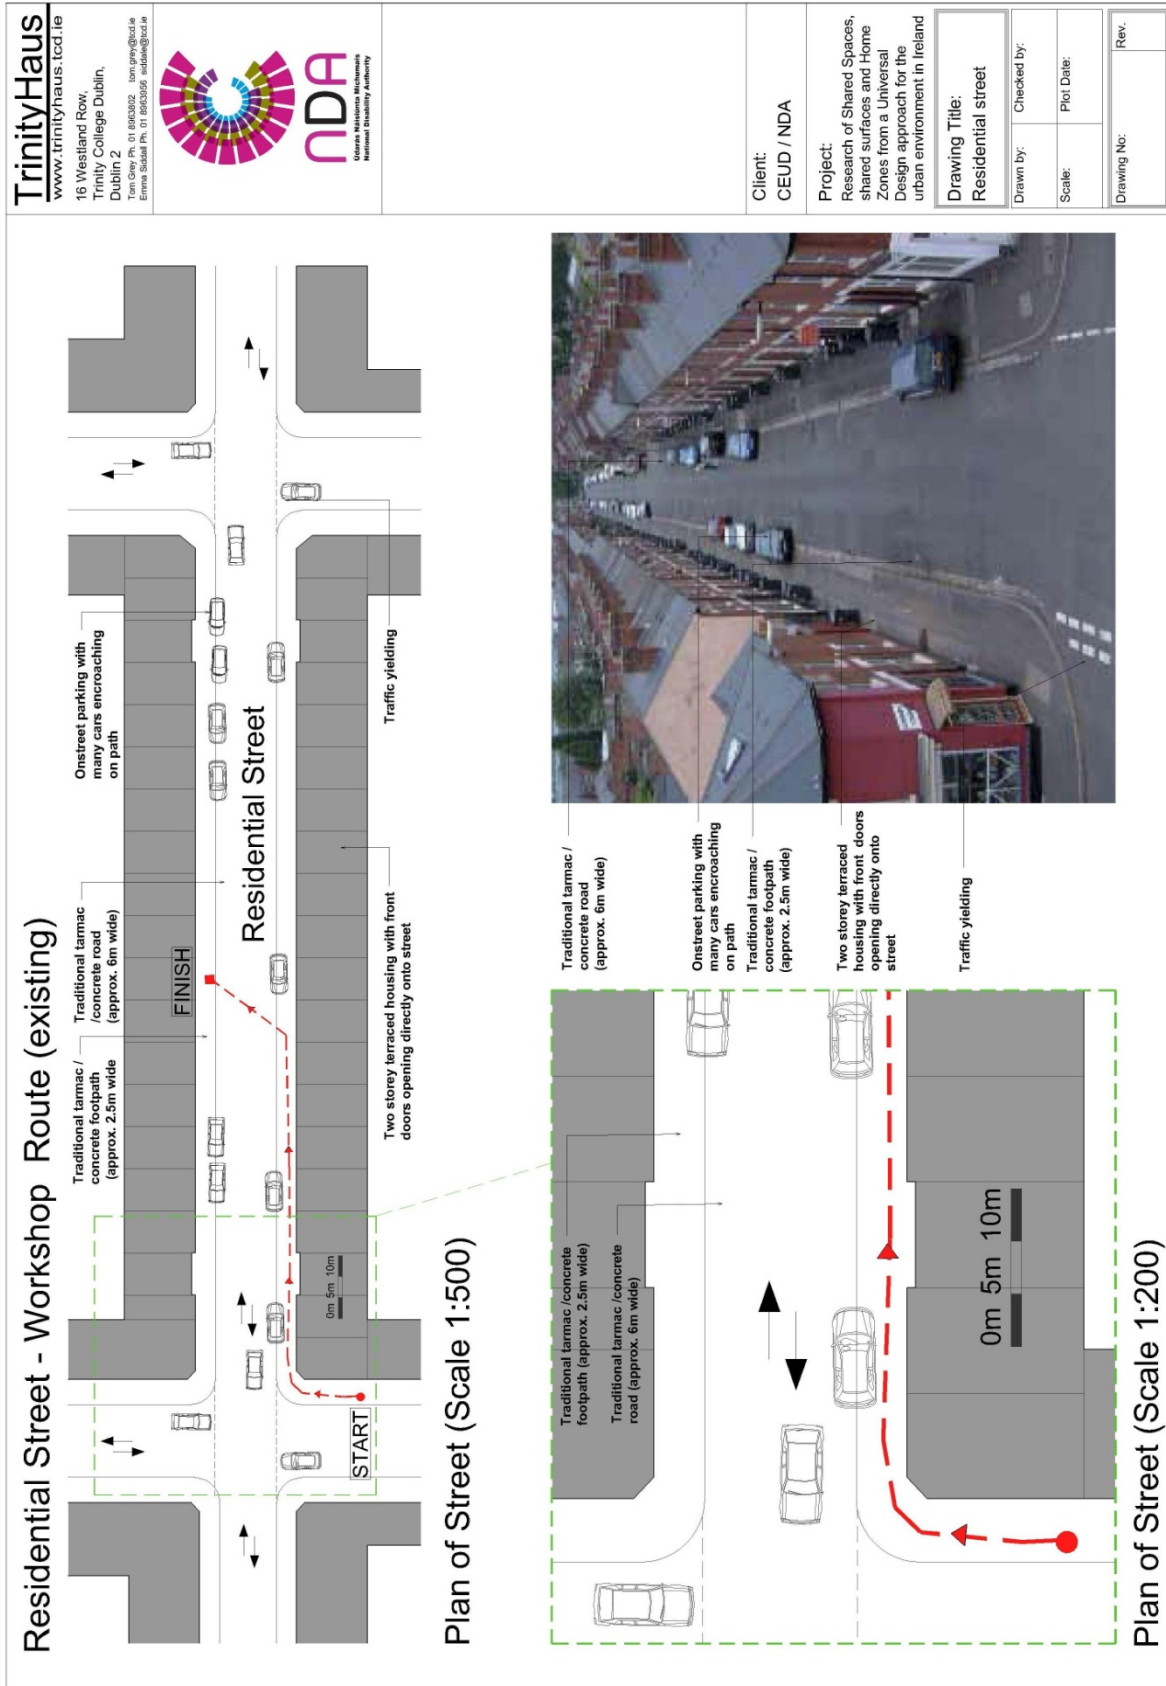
Plan drawing & photos of the traditional residential street route (exercise 1, route 2)
